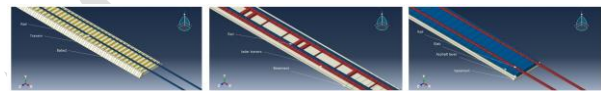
Numerical representation of the ballasted, ladder, and concrete slab track systems
